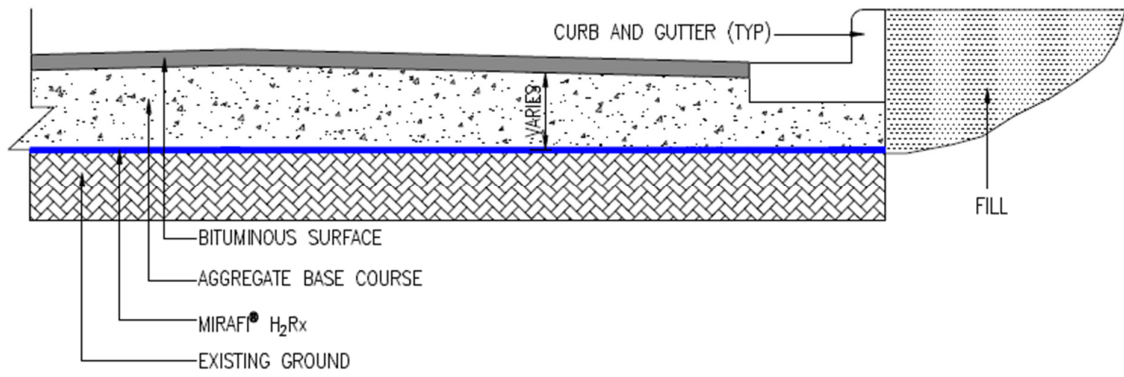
(a): A typical cross section diagram for geotextile edge terminated within.
